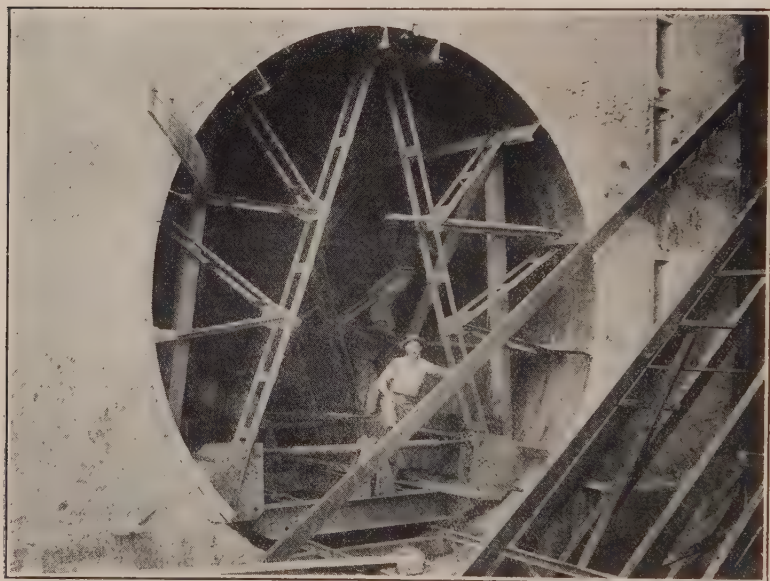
Collapsible Steel Forms for Construction of 18-Ft. Diameter Wall Culverts, Gatun Lower Locks.
